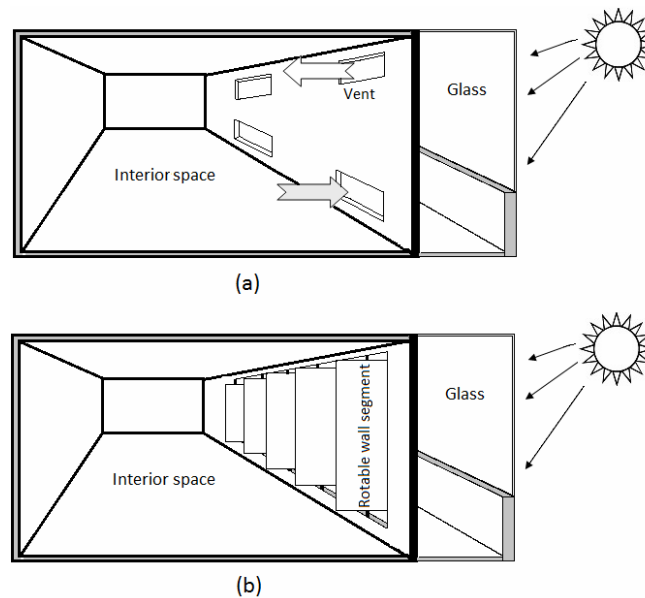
a) Trombe solar wall, b) rotatable wall segments.
